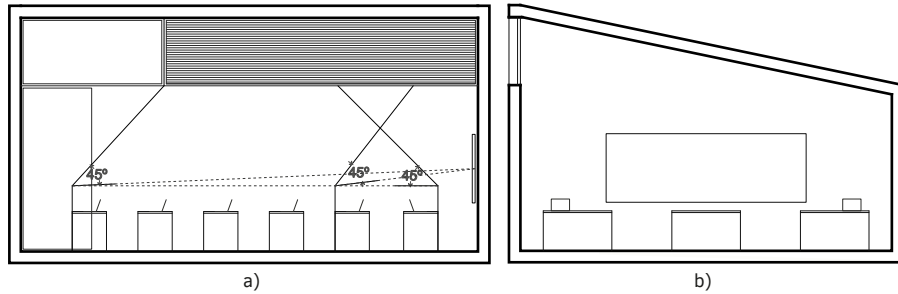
High window partially located outside the 45° central view cone, with a raised slanted ceiling: (a) longitudinal and (b) cross-section. The visible part of the window will require a reduction of window luminance (see 10.4.2).
